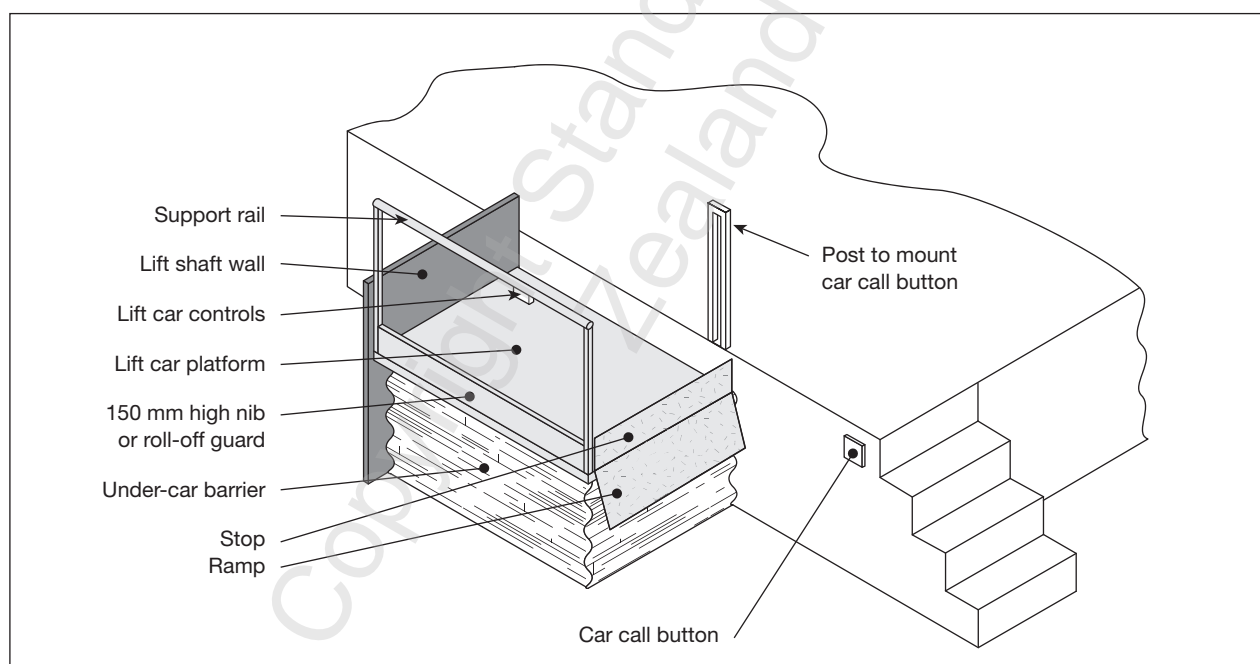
Example of an open platform lift (no car walls) with travel distance less than 1 m
